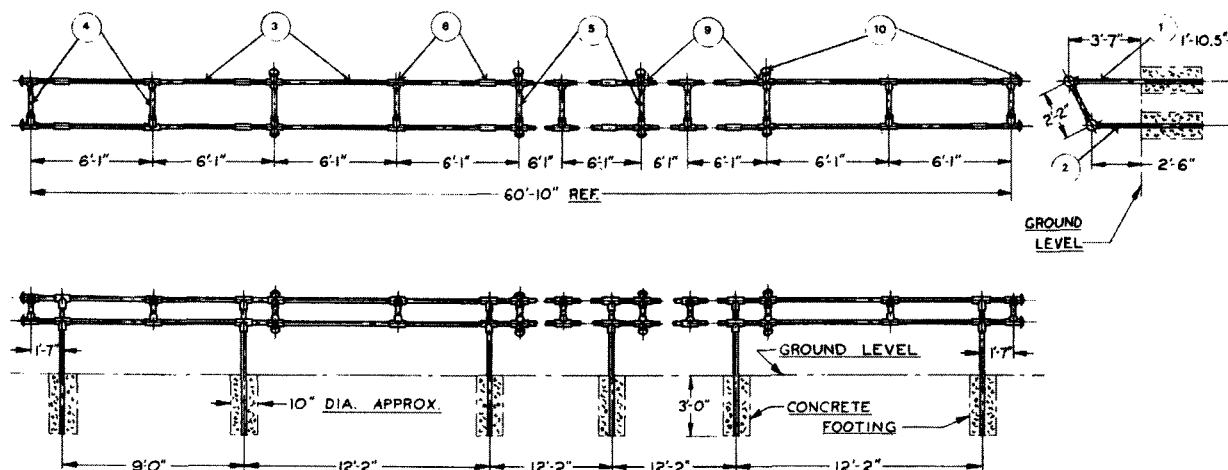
Atmospheric exposure test rack support design (see ASTM G 50).
